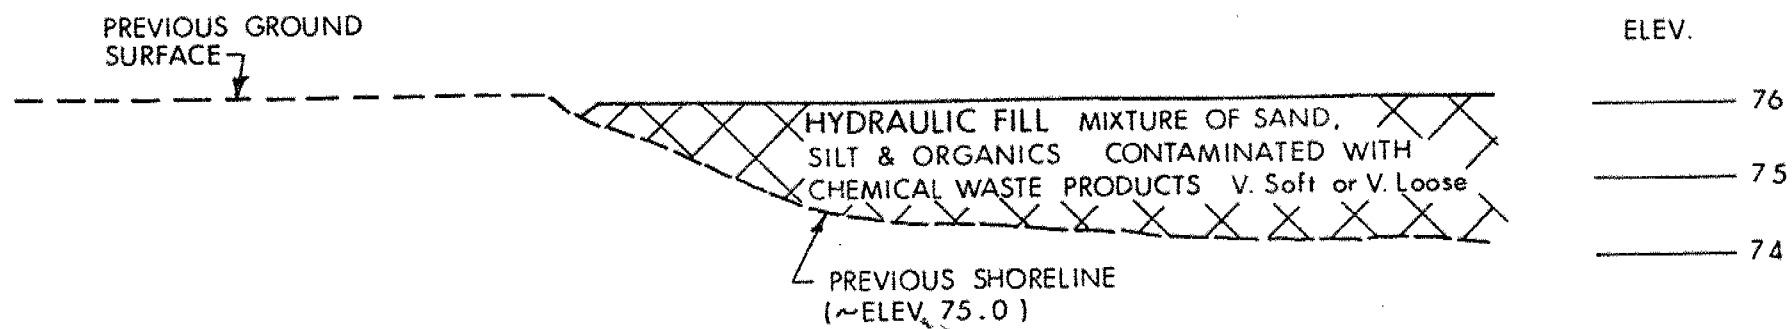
TYPICAL SECTION STA. 15+000 to STA. 15+325
